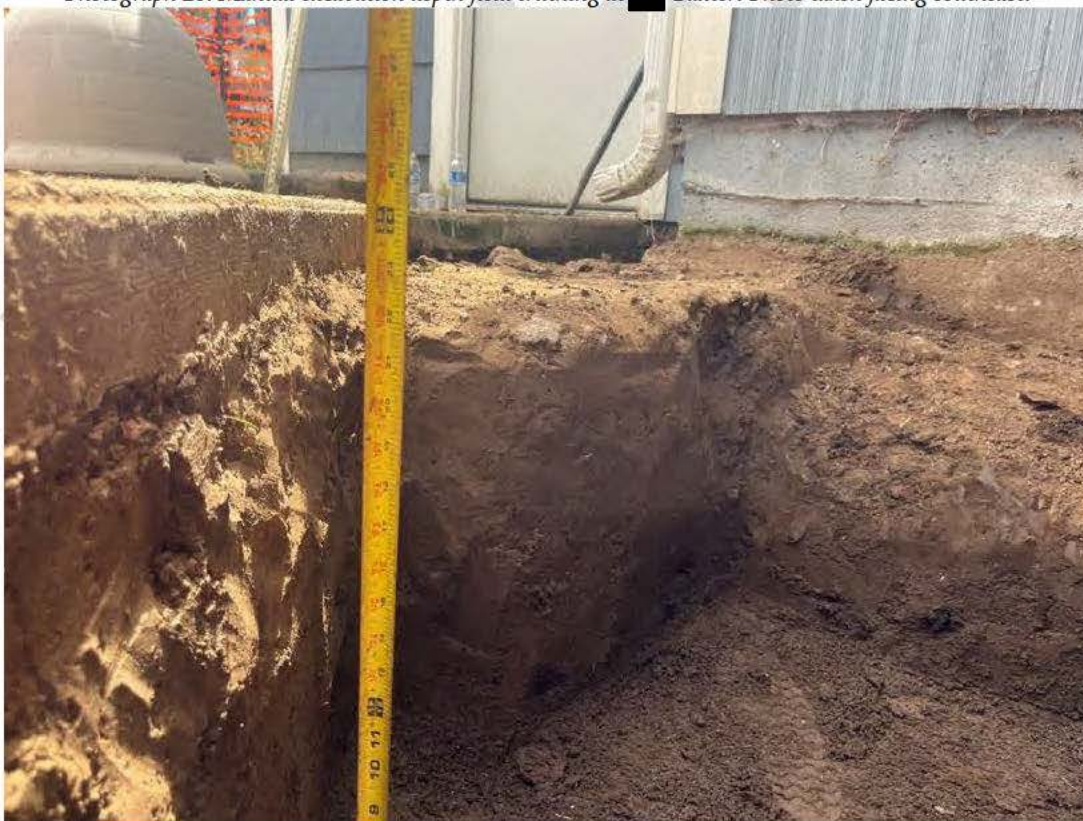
Excavation along fence line at [REDACTED] Baxter. Photo taken facing southwest.
